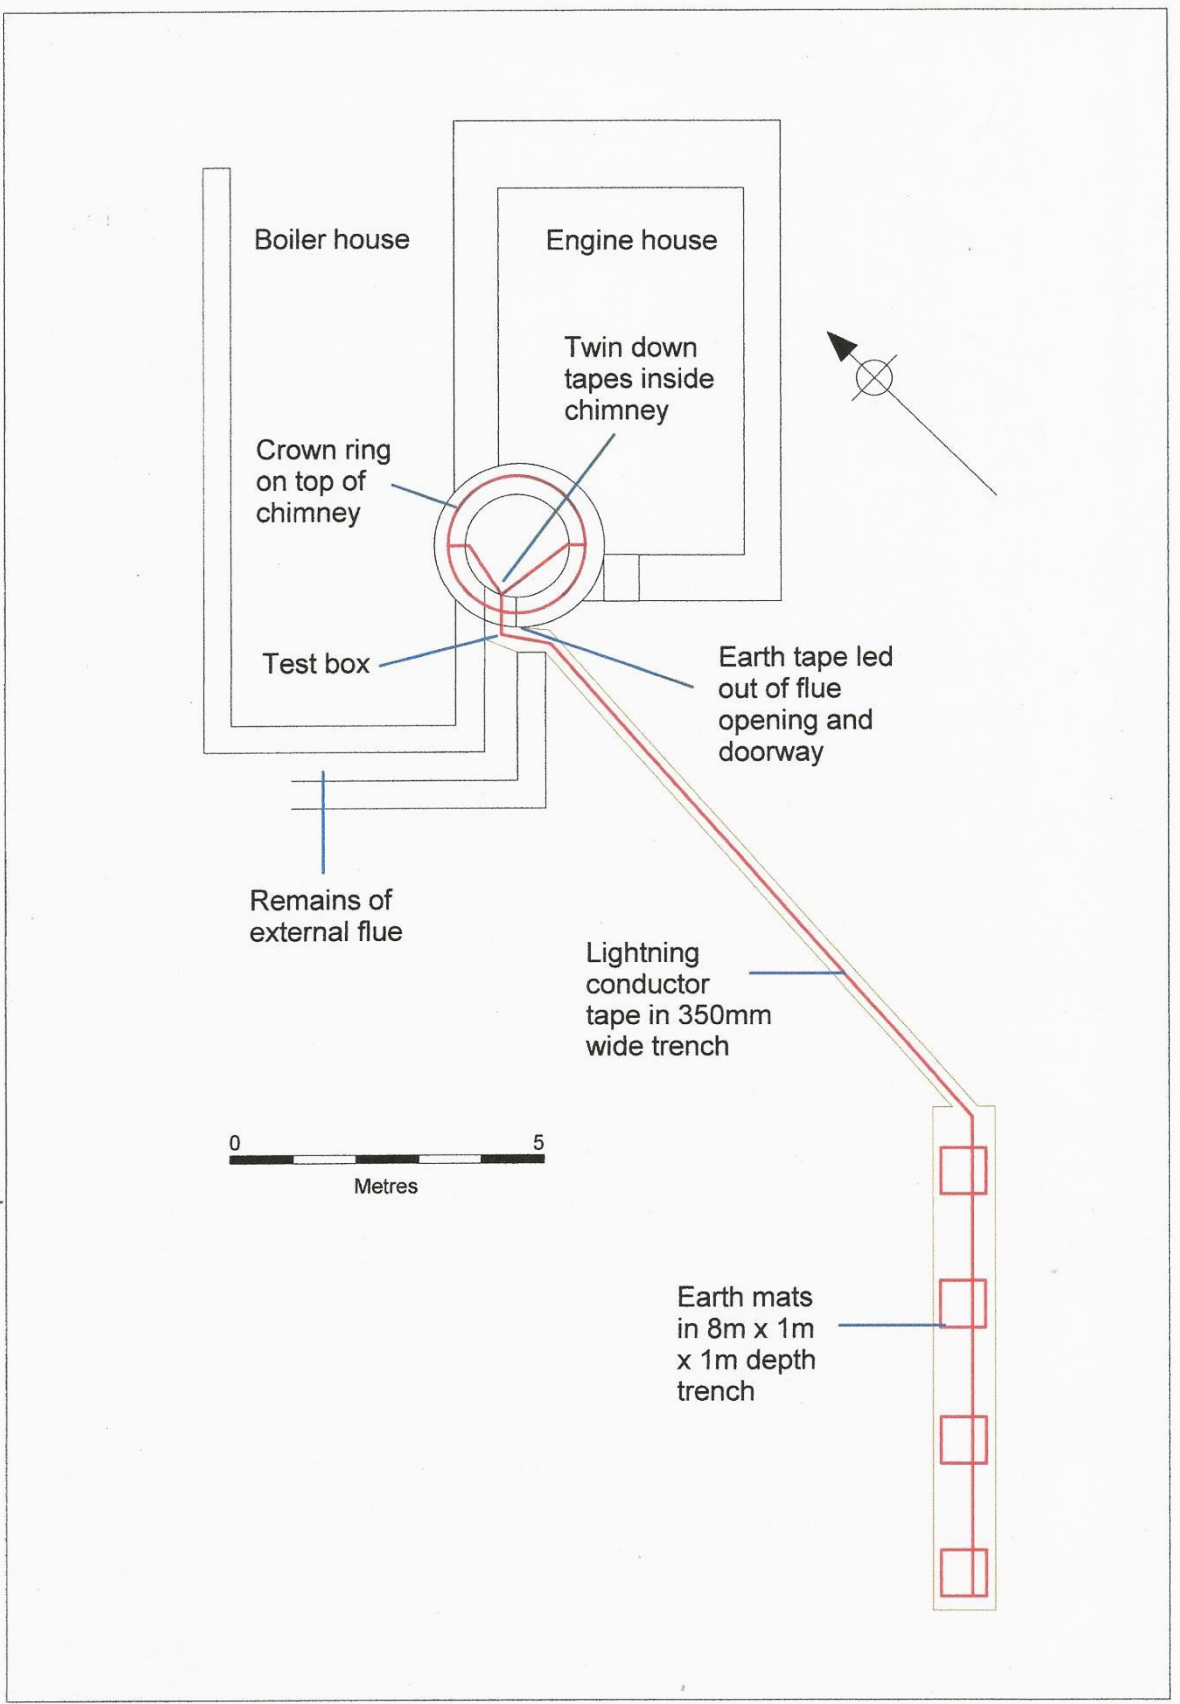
A plan of the earth protection system installed by St. Ives Steeplejacks.
